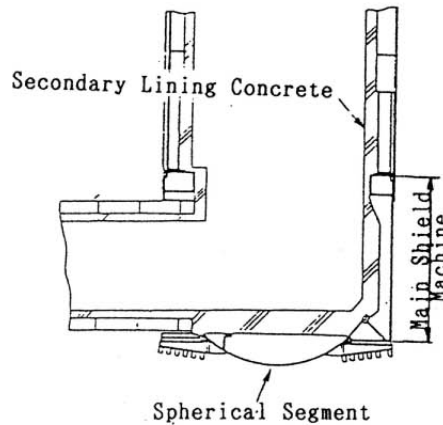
Final shaft shape of vertical-horizontal continuous shield
